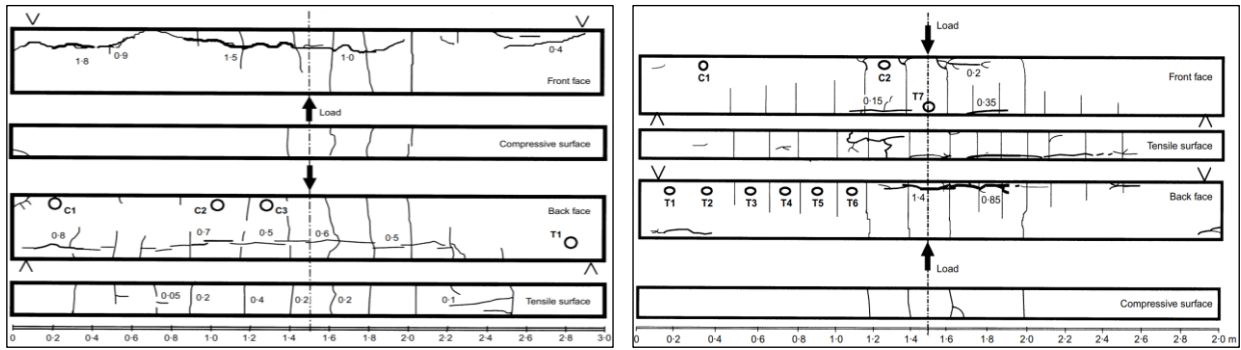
Cracking maps of A1CL beam (left) and B1CL beam (right)[68]
